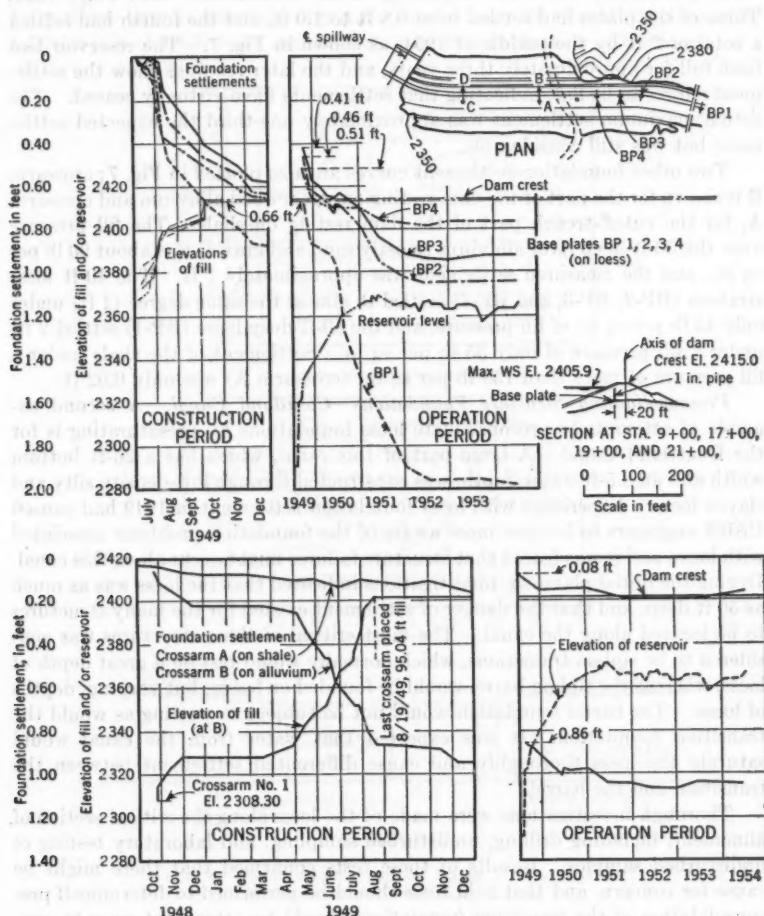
FOUNDATION SETTLEMENT AT MEDICINE CREEK DAM
